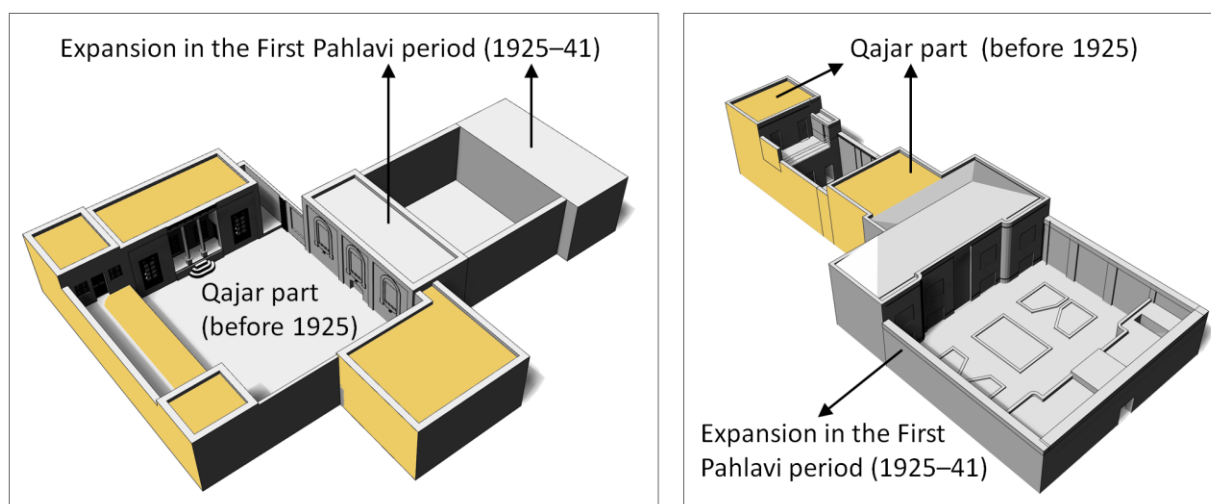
horizontal expansion of the Mohammadiyani (left) and Eslami (right) houses
